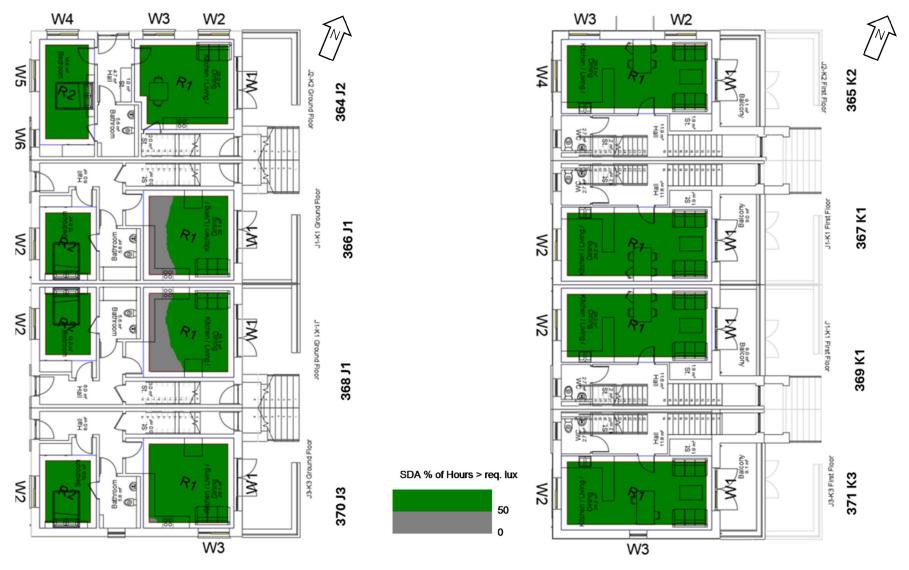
Apartment 368-366 J1, 364 J2 & 370 J3 Ground Floor sDA Contours
